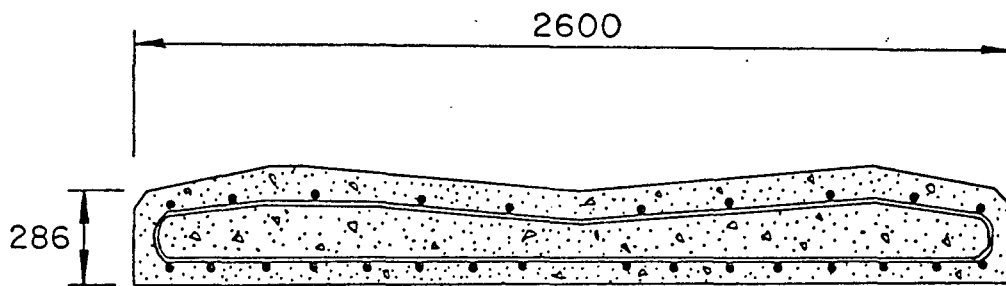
Cross-Section of the Slab Tested by the British Railways (BR)
